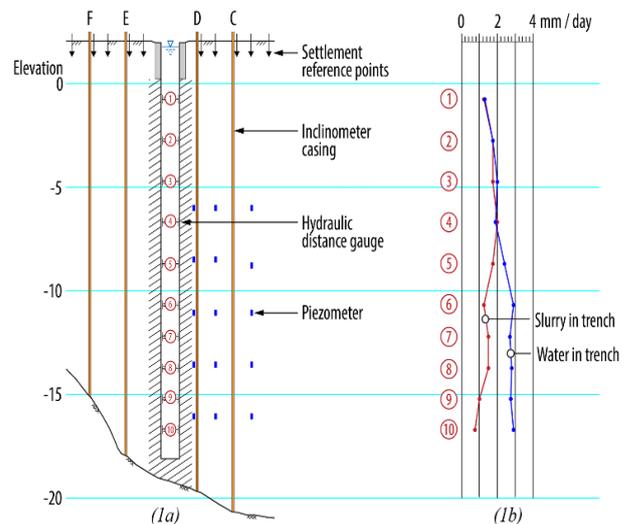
(a) Cross section of the 1 x 5 m trench and instrumentation details. (b) Change in width of the trench the last day it was stabilized with bentonite slurry and change per day afterwards when filled with water.
